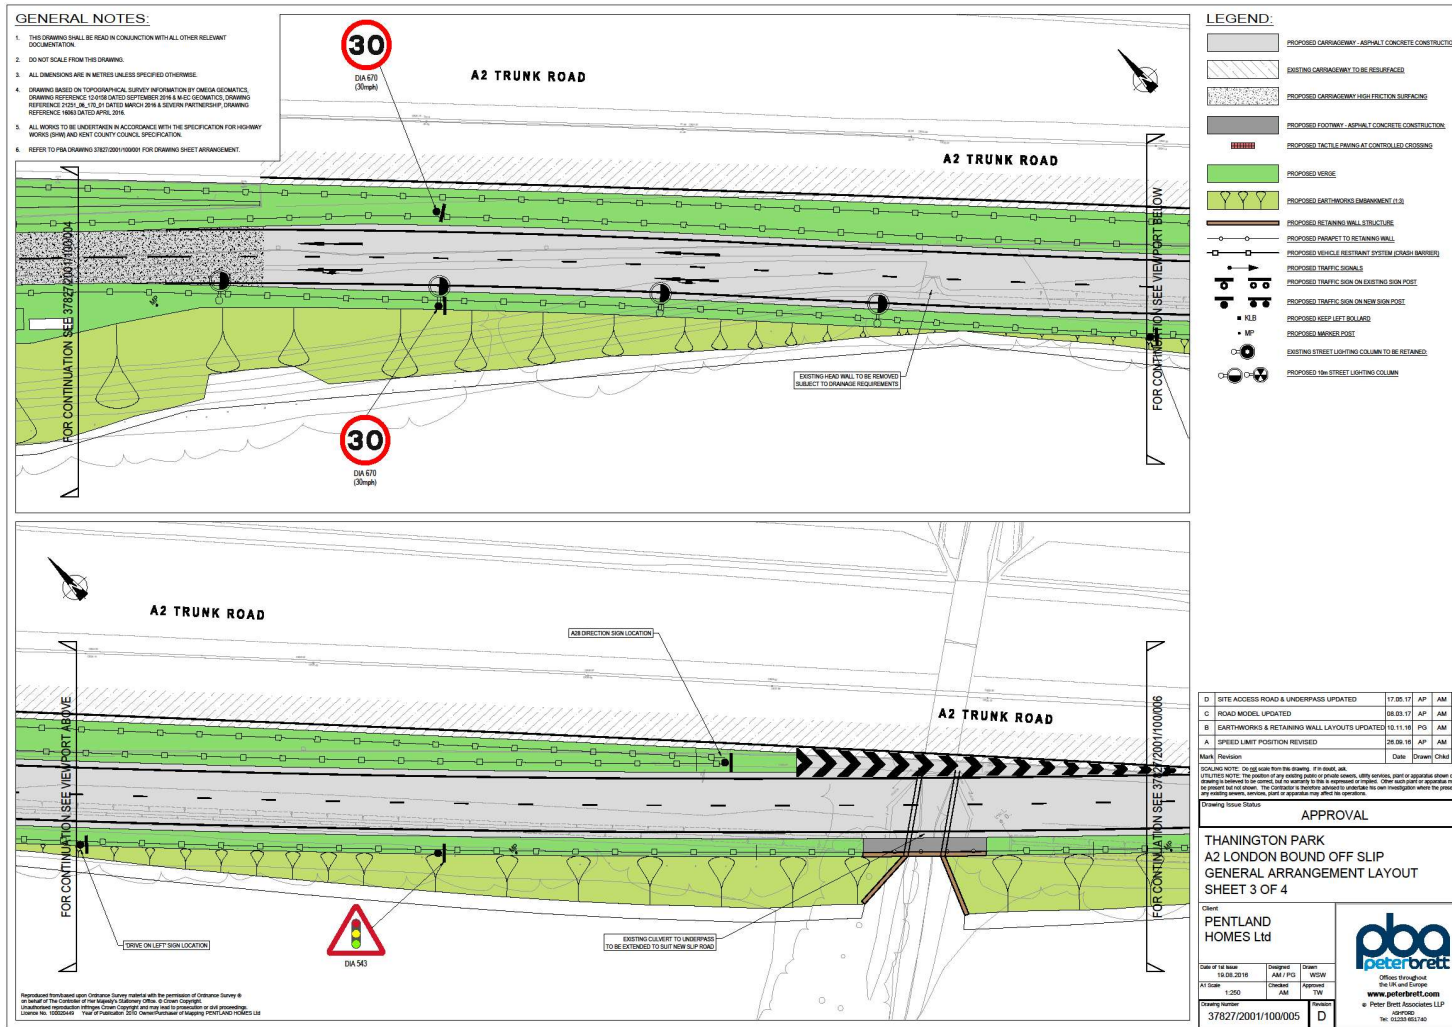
Thanington Park Off Slip General Arrangement Layout
